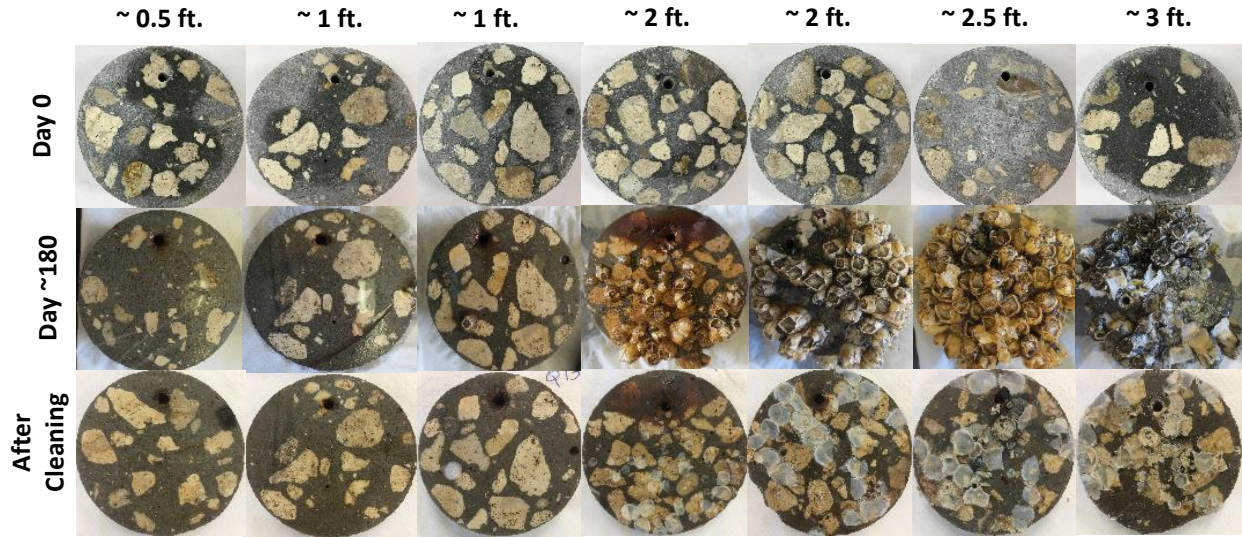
Images of Concrete Samples Exposed to US-301 Outdoor Conditions.
